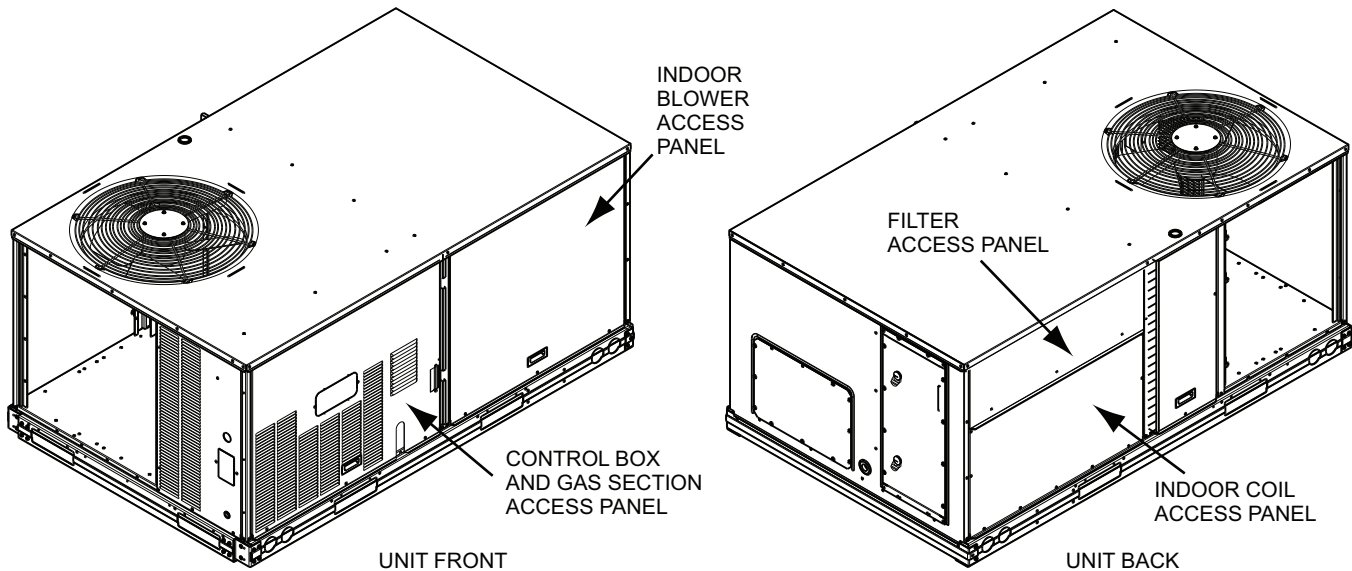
48/50LC Size 04-06 Units – Panel and Filter Locations (48LC*04 Unit Shown)
